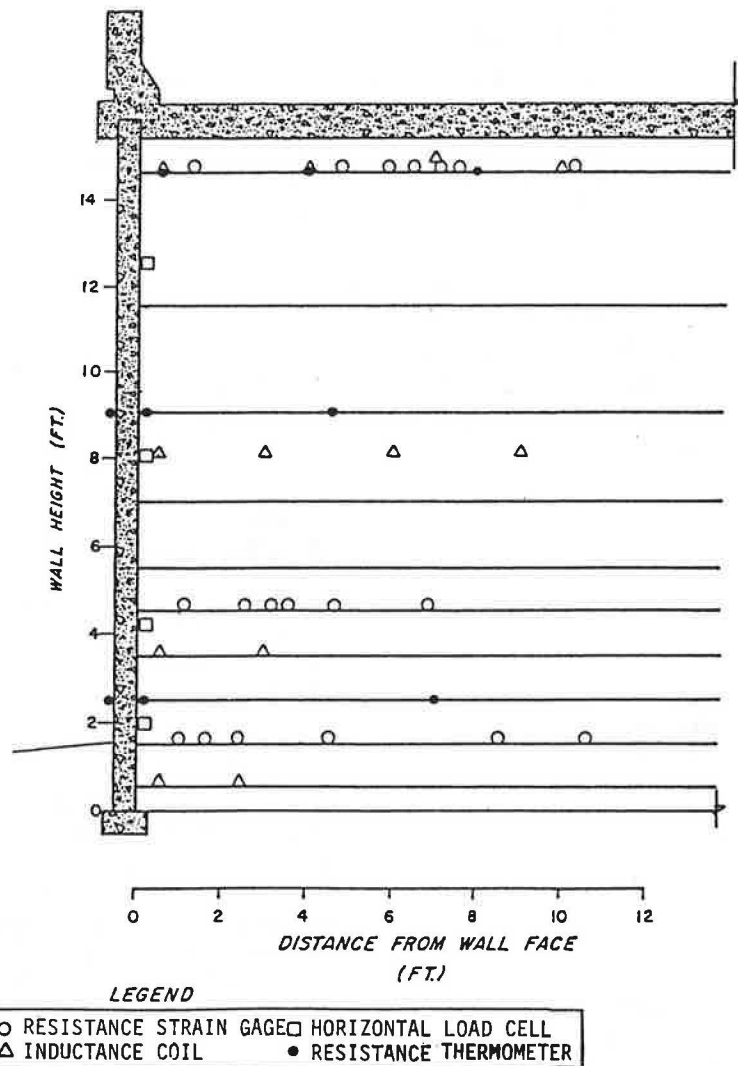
Schematic of instrumented earth reinforced retaining wall, Wall 26-30.
